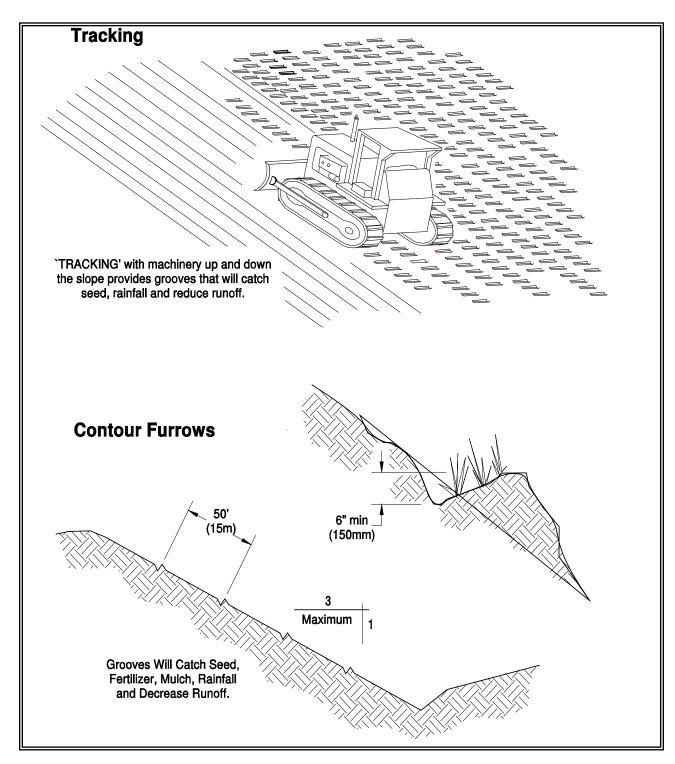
Surface Roughening by Tracking and Contour Furrows
